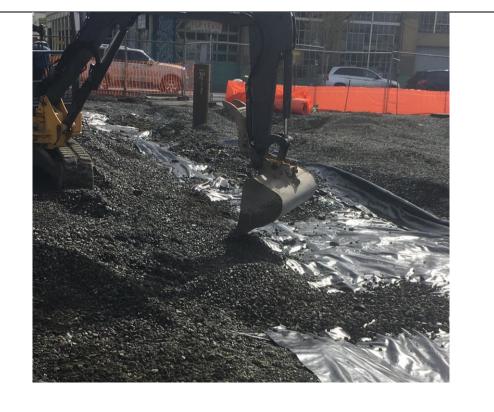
Extension of Storm Drain Pipe Date: 3/18/2019 Direction Photo Taken: West Description: Trench of sewer pipe
